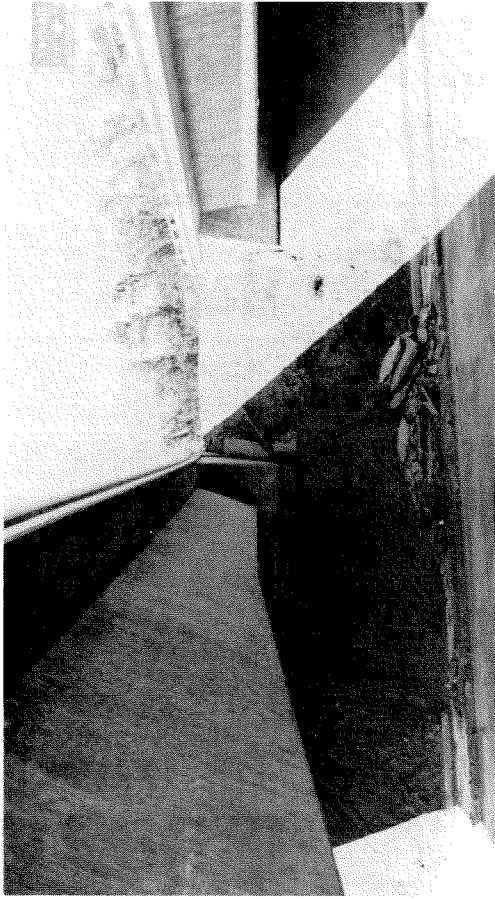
Western abutments of the Roxford Street undercrossing, Foothill freeway.
